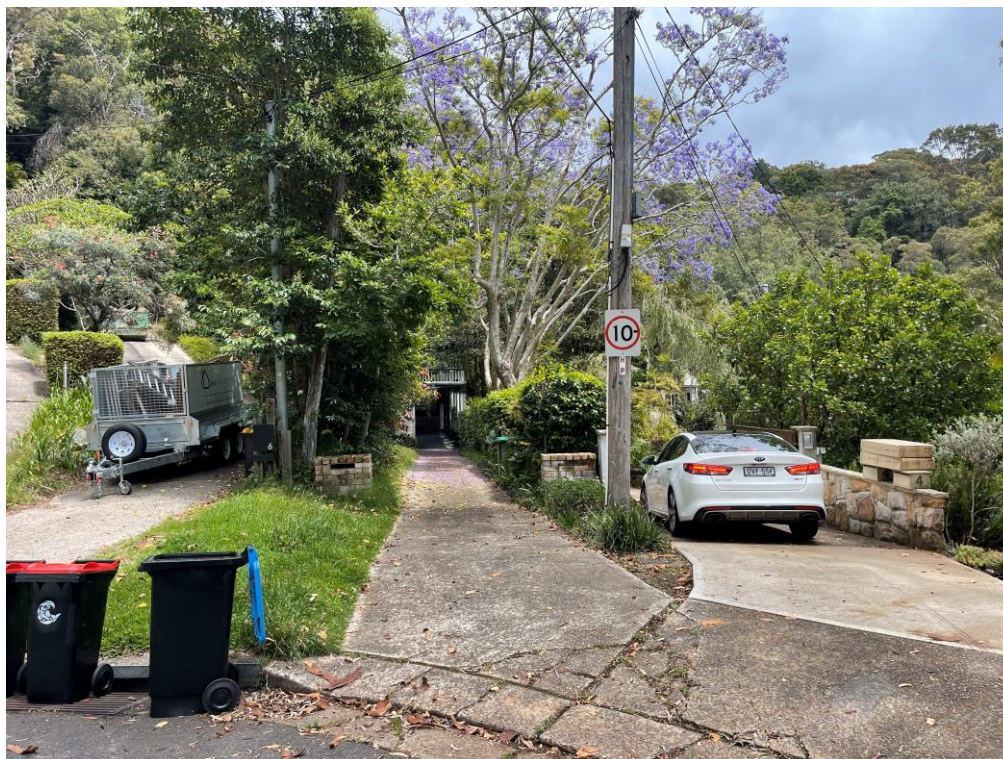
View of the driveway entry to the site, looking west from the Taminga Street cul-de-sac
